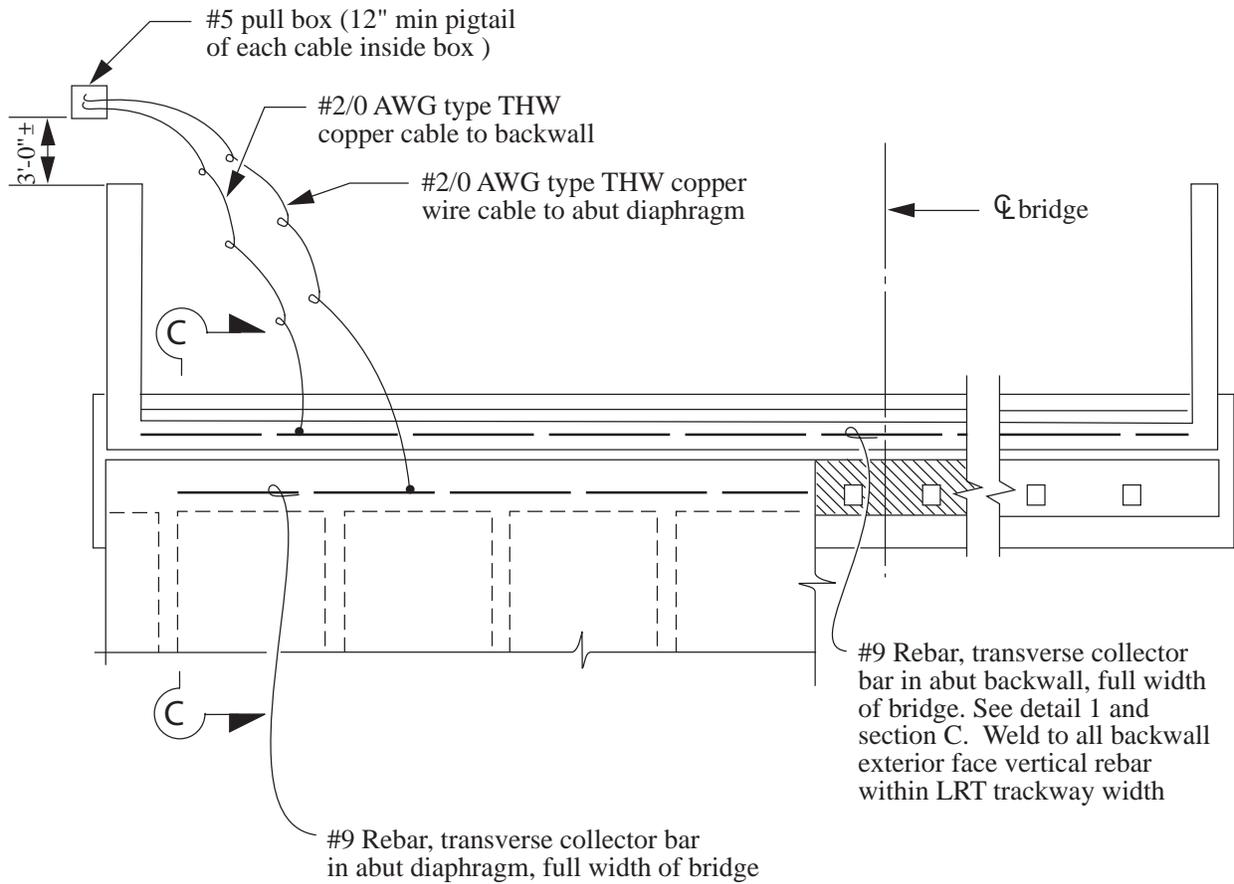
COPPER CABLE TO REBAR CONNECTION
